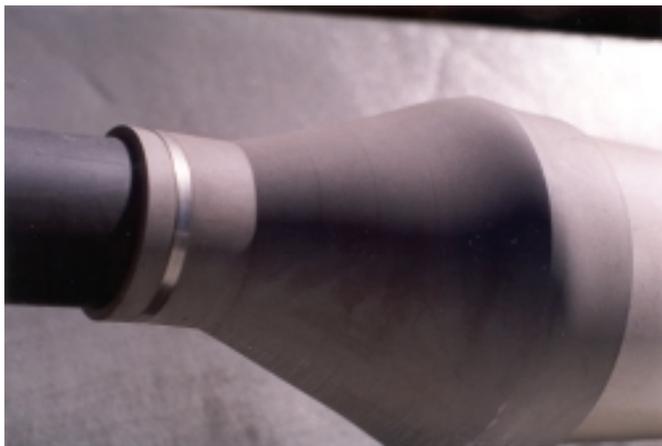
Cable-stay boot connects the external stay pipe to the transition pipe at the anchors on Sunniberg Bridge.
